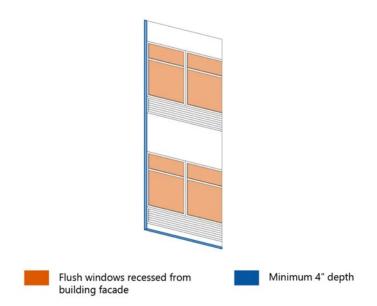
WINDOWS IN RECESSED FAÇADE MODULATIONS
